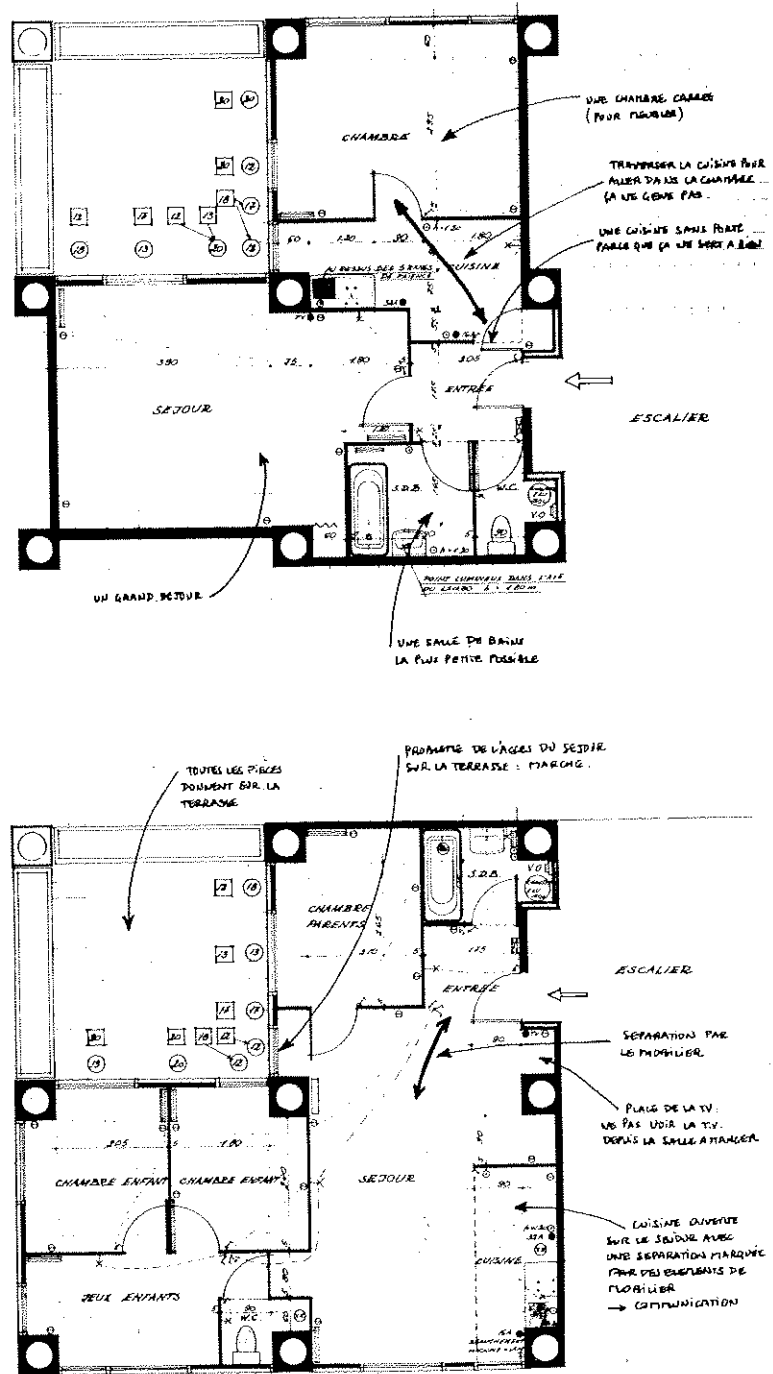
Plans of apartments: A: for a young couple (teacher and student); C: for a couple (employees) with 2 young children.
